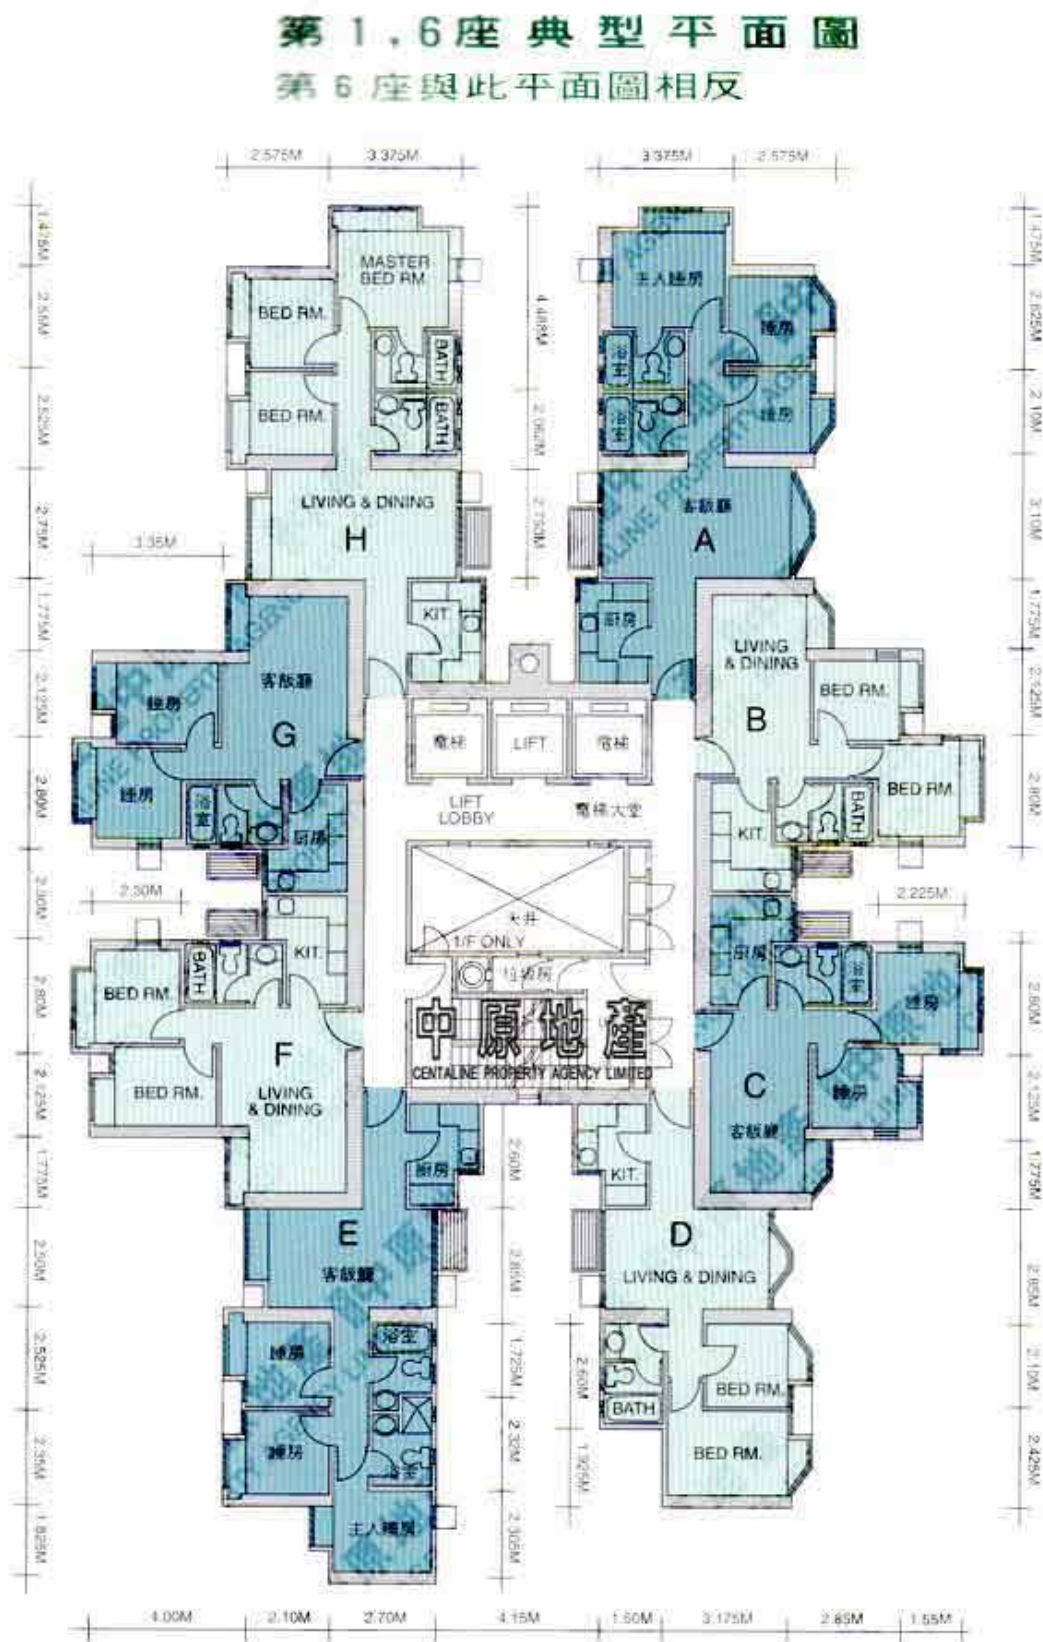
Building Plan of Block 1 and 6 of Bayshore Towers
